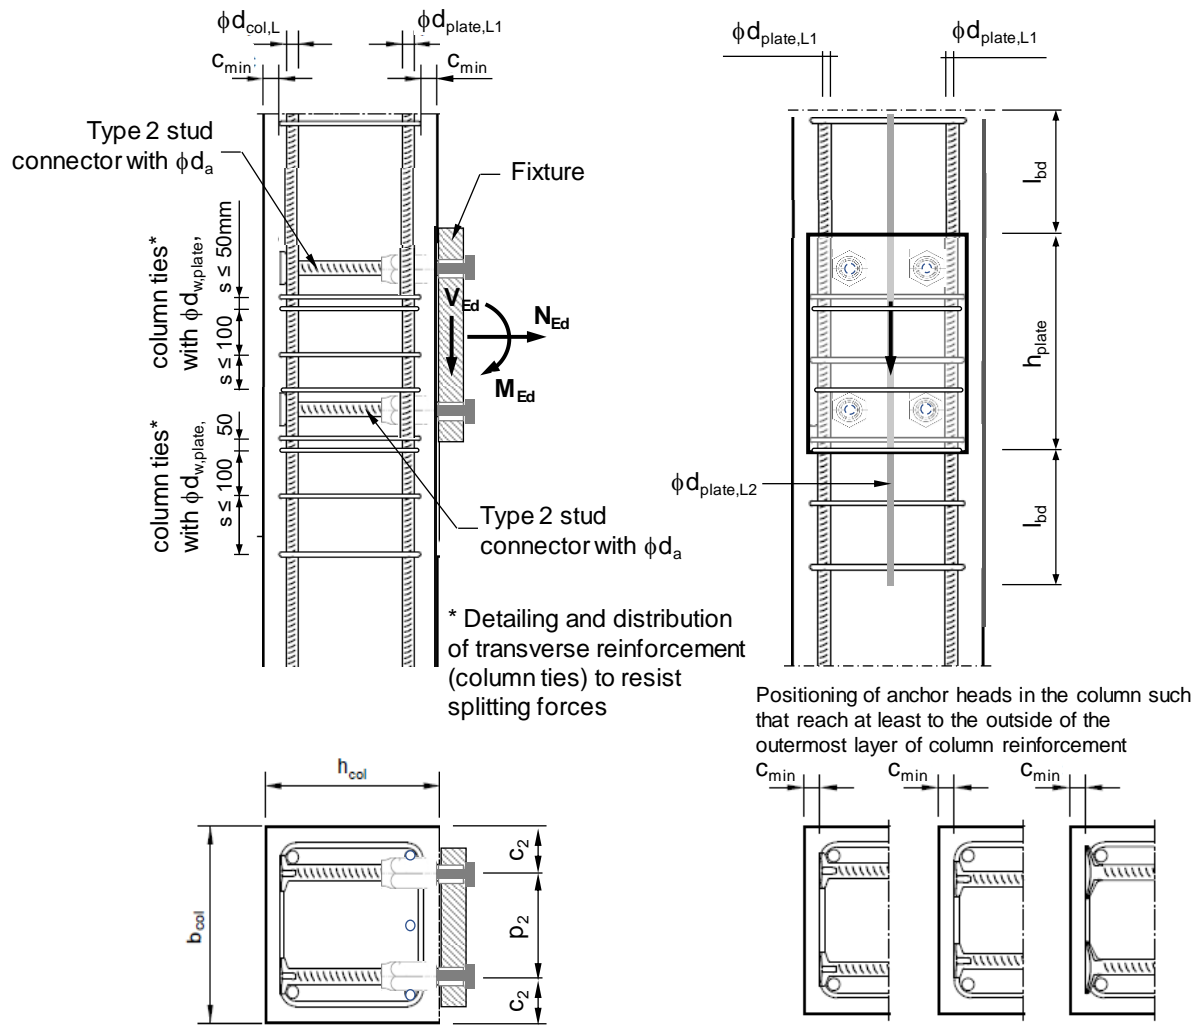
Dimensions and reinforcement details of a connection between structural steel member and supporting reinforced concrete member
